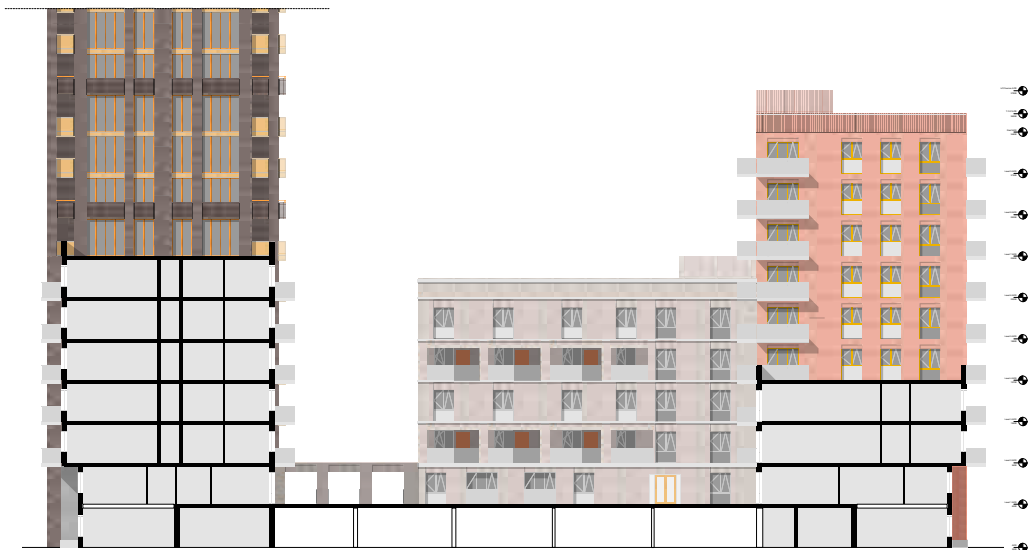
Block 4 North Elevation (Courtyard) Planning Submission October 2014
